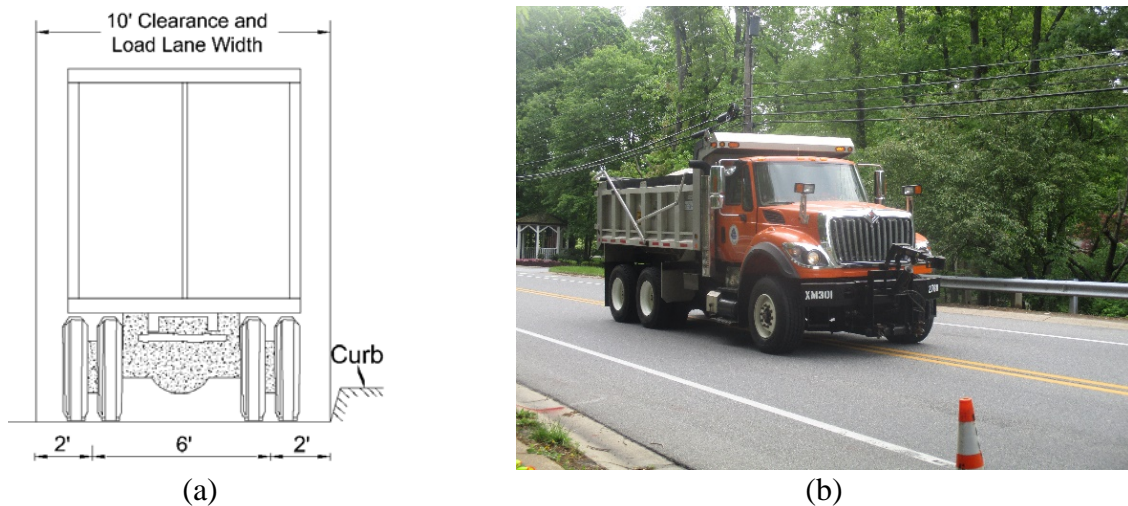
Test truck: (a) cross-sectional dimensions; (b) picture taken during testing
